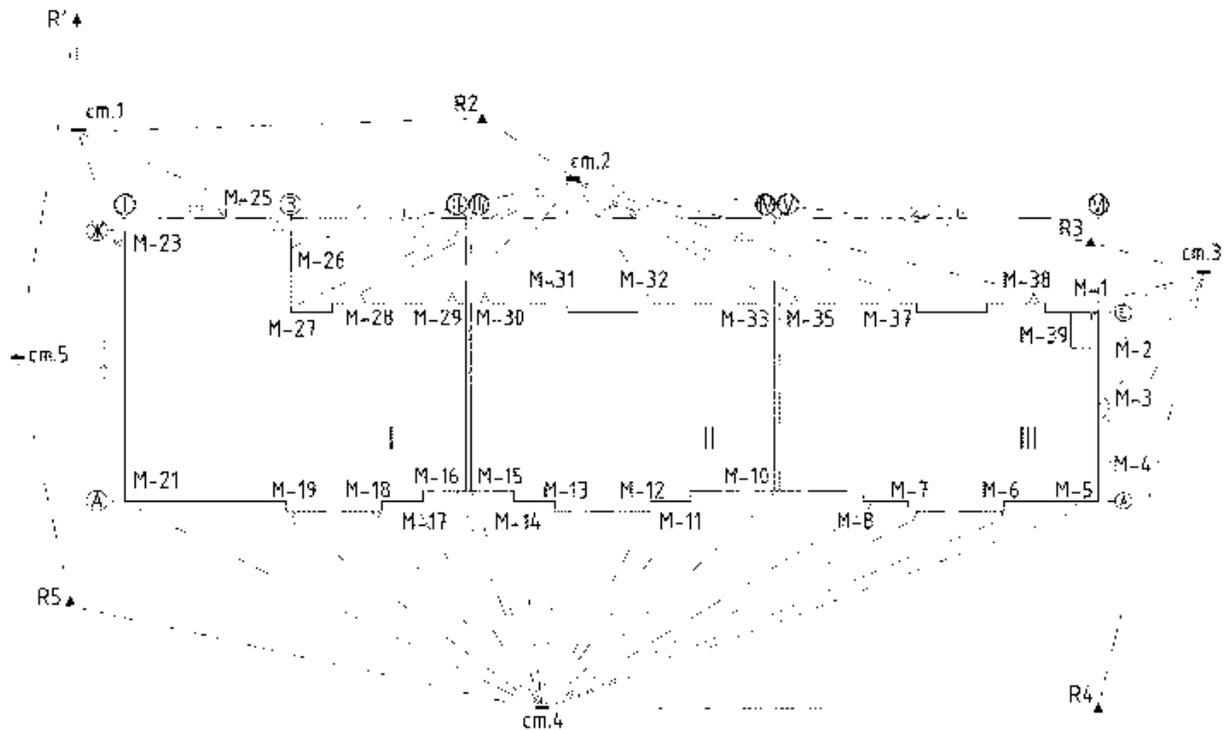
Scheme of the geodetic leveling marks of nine-ten storey house on (str. V. Kozak, 14 in Poltava) I-III – building sections; M-1...M39 – wall leveling marks; R-1...R-5 – bench marks; st. 1... st. 5 – leveling intermediate stations
